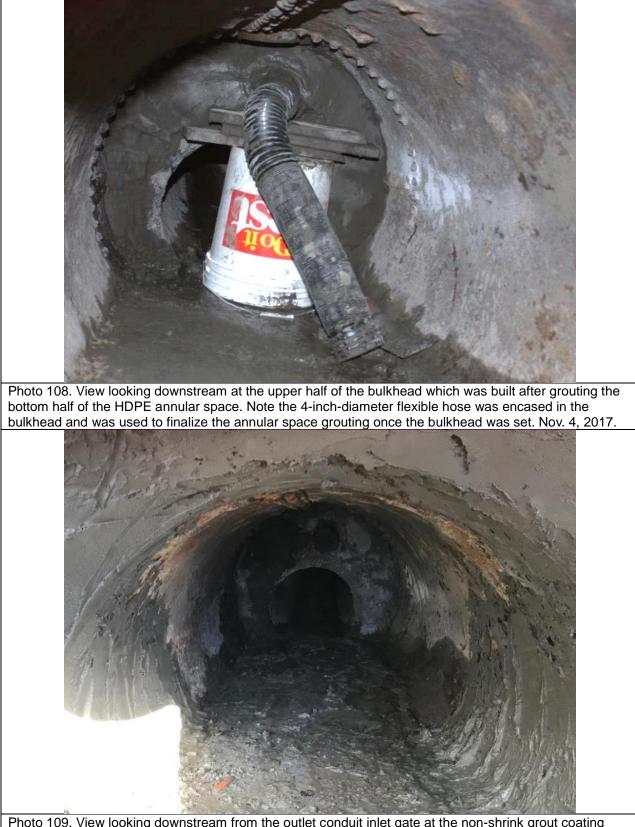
View looking downstream from the outlet conduit inlet gate at the non-shrink grout coating being installed in the invert and around the perimeter of the existing riveted steel outlet works pipe. Note, additional non-shrink grout was placed along the top of the existing riveted steel outlet works pipe after this picture was taken. Nov. 7, 2017.
